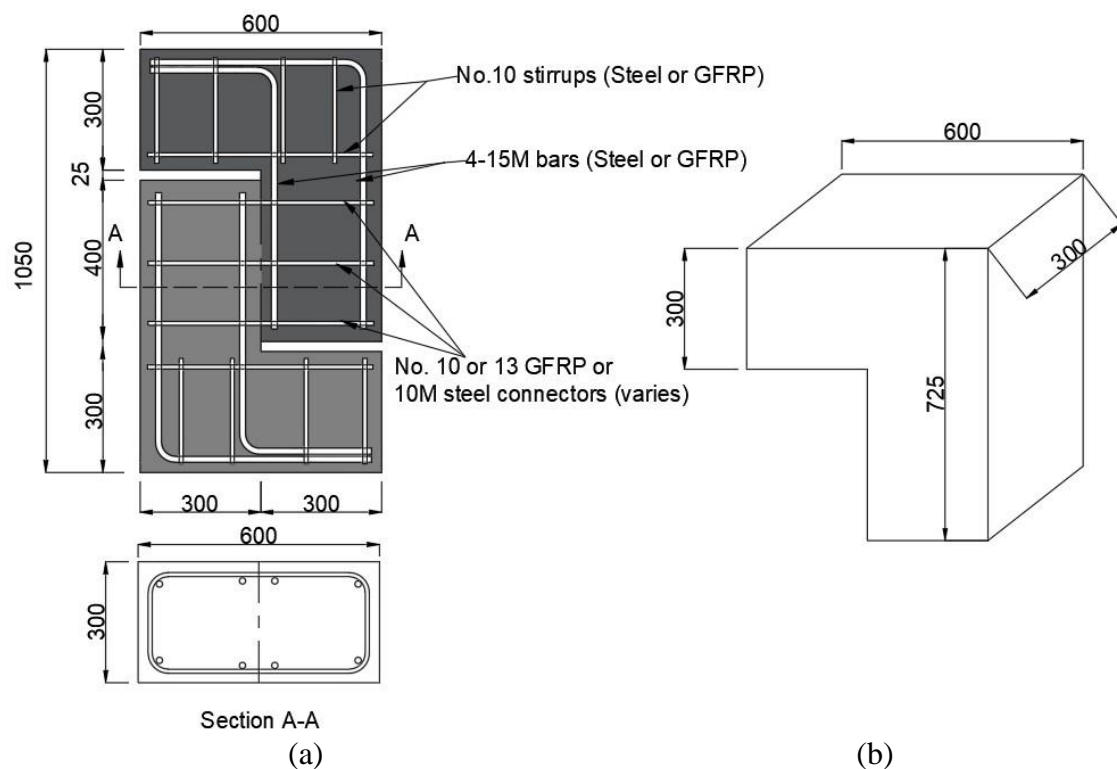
Test specimen, (a) specimen geometry, and (b) typical L-block geometry
